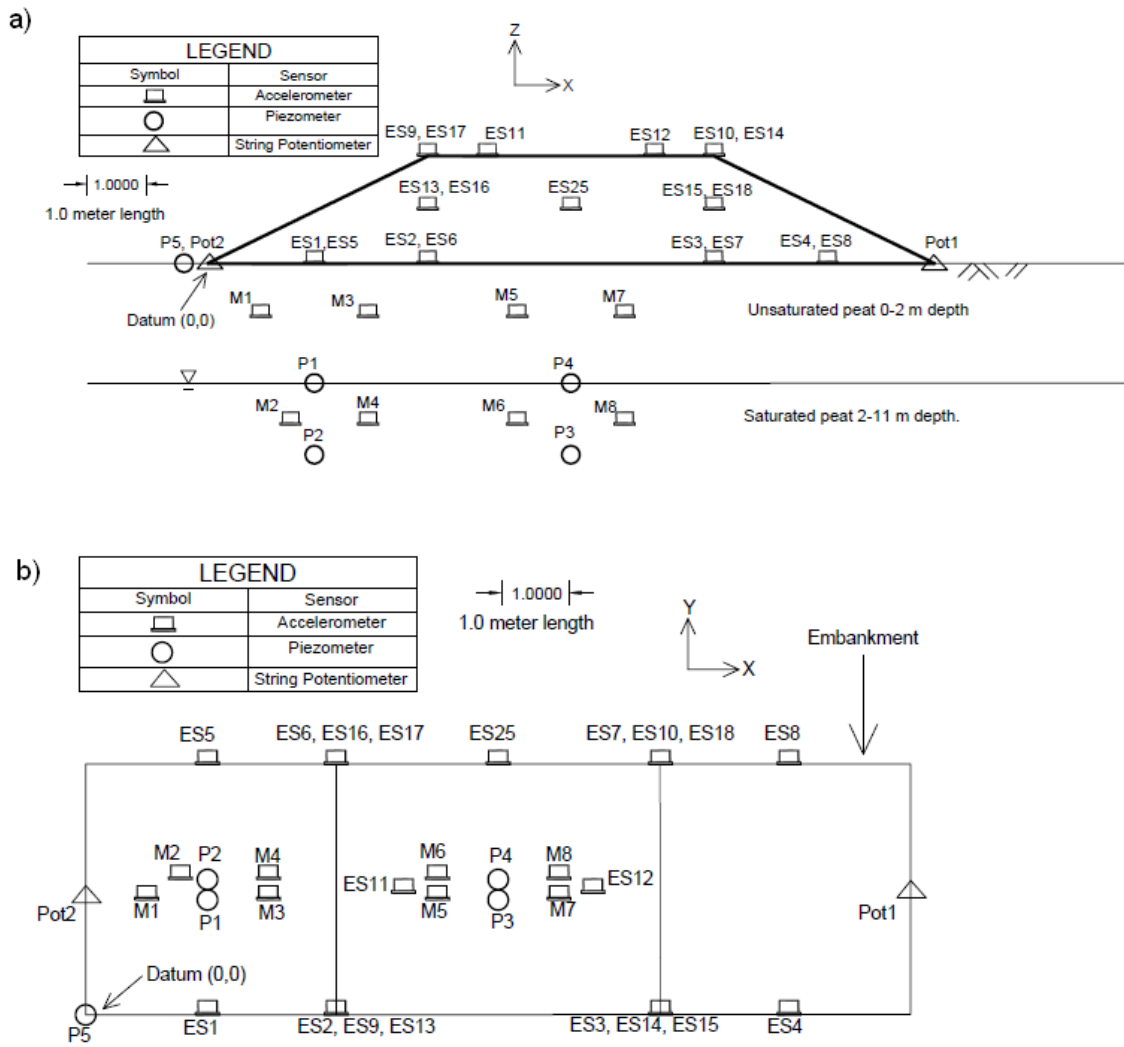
(a) Elevation and (b) plan view of the sensor layout used in the 2011 test. Shaker sketch omitted for clarity.
